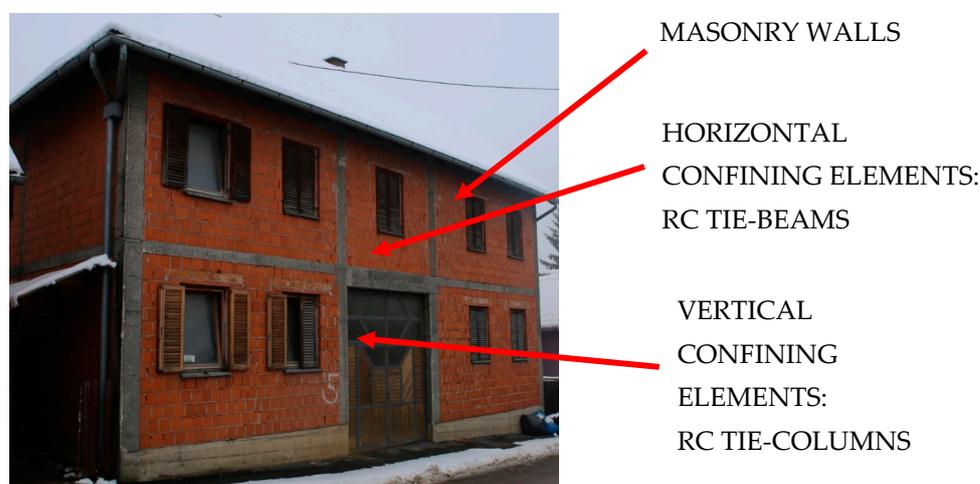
Key components of a typical CM building from the Balkan region (Petrinja, Croatia).
